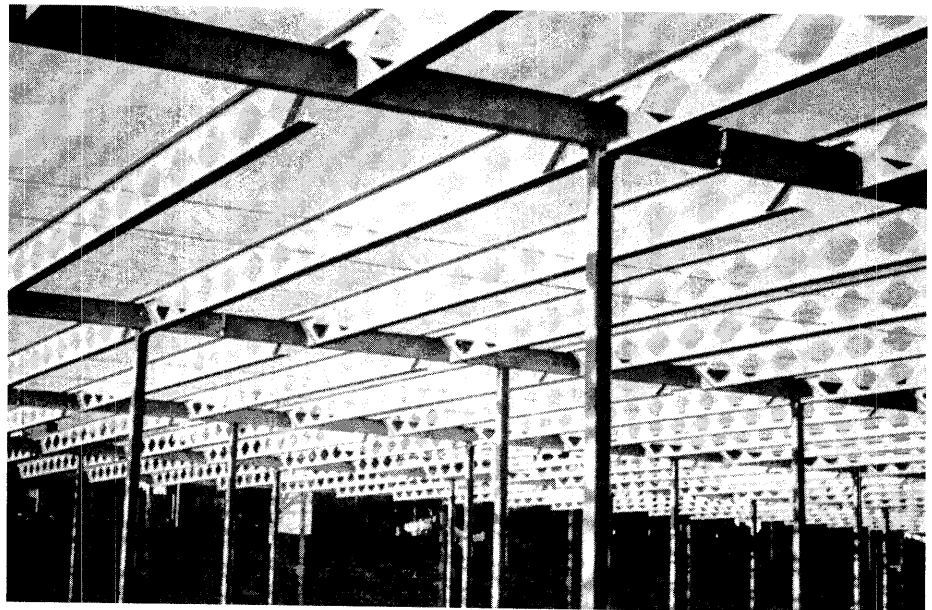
Castellated steel beams. (Courtesy of American Institute of Steel Construction)
